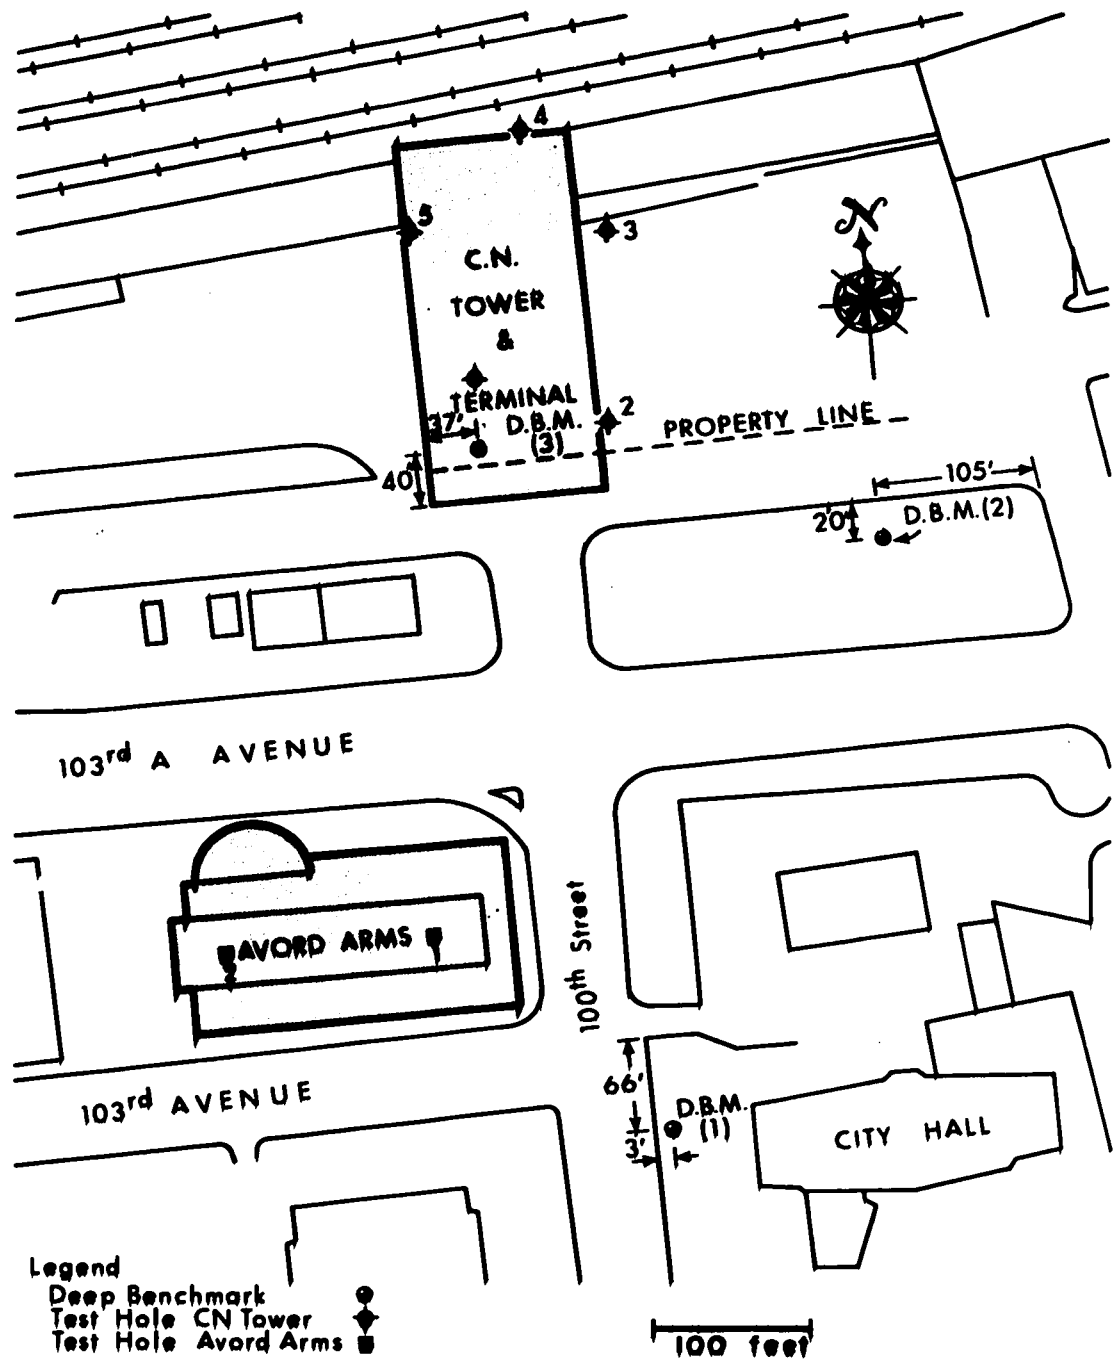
Detail Map A, Location of CN Tower, Avord Arms Building, Testholes and Deep Benchmarks
